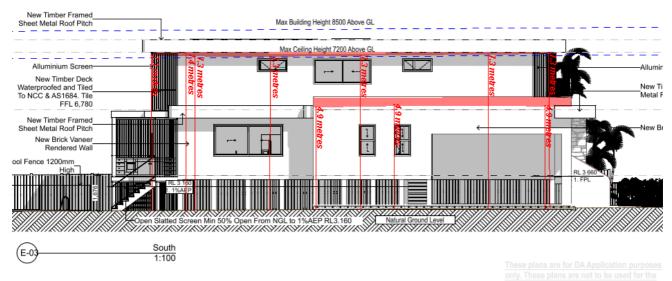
South Elevation (red highlighting building envelope numerical non-compliance)
